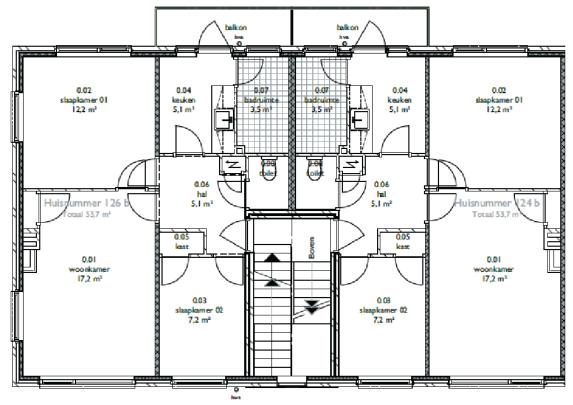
Typical lay-out of two post-war walk-up apartments. Adapted from (KAW, 2017, DO-02\_b)
